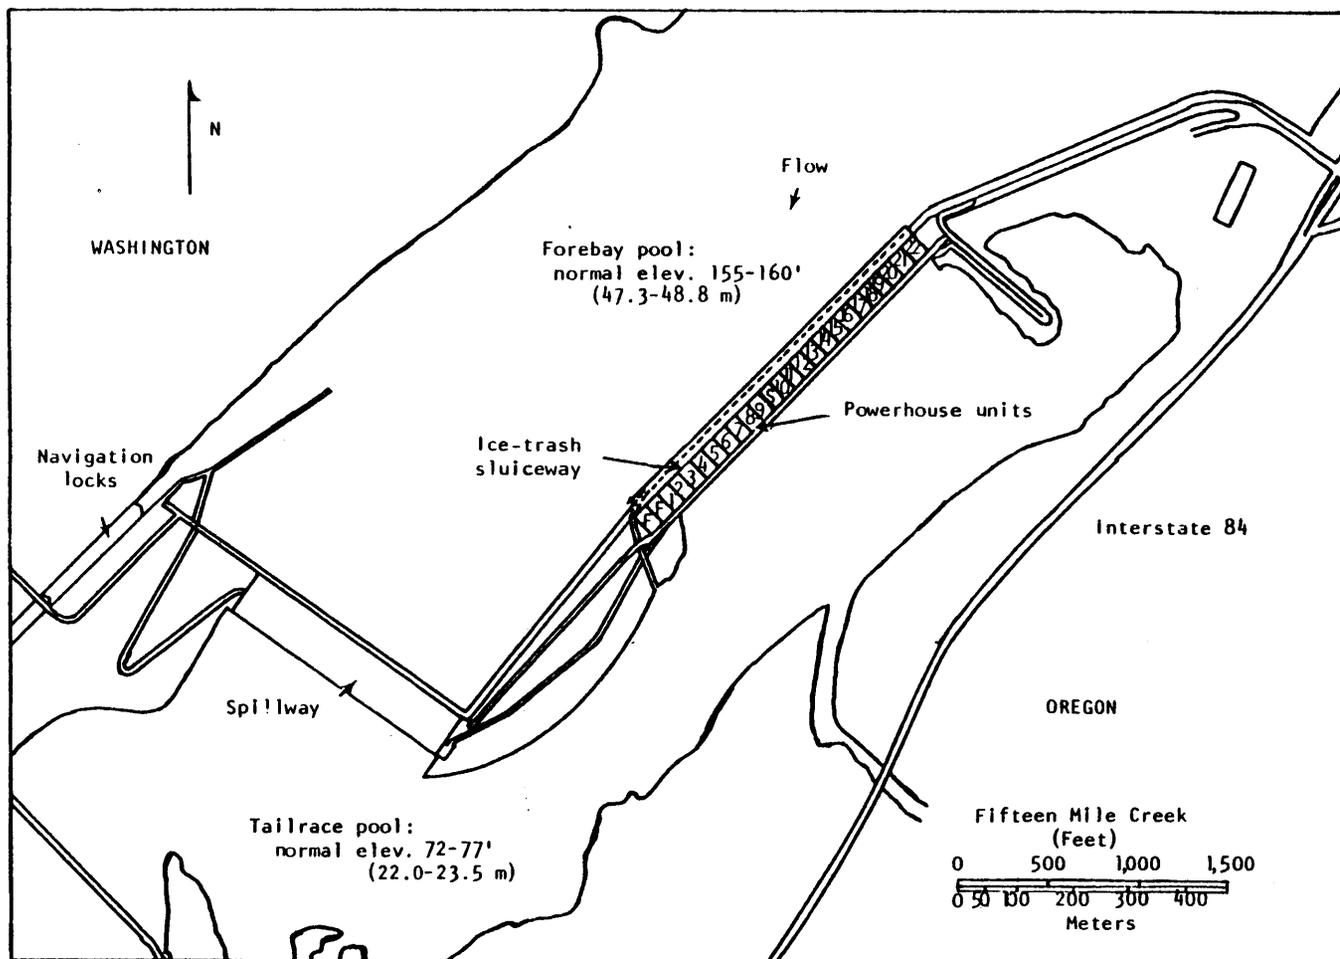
Plan view of The Dalles Dam, Columbia River.
